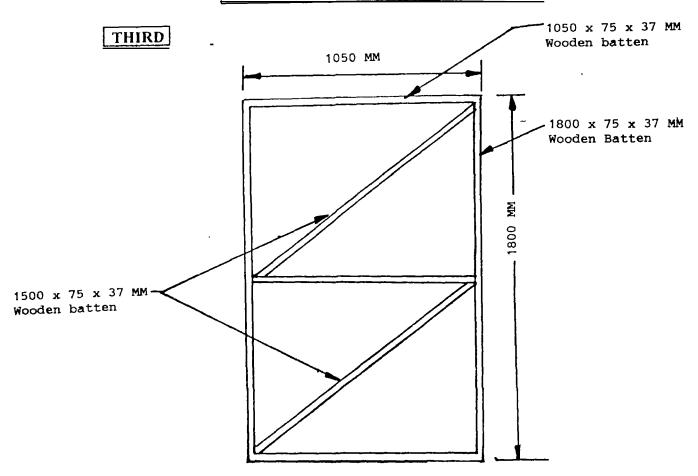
DETAIL OF CEMENT TREATED GUNNY BAG SUPERSTRUCTURE
